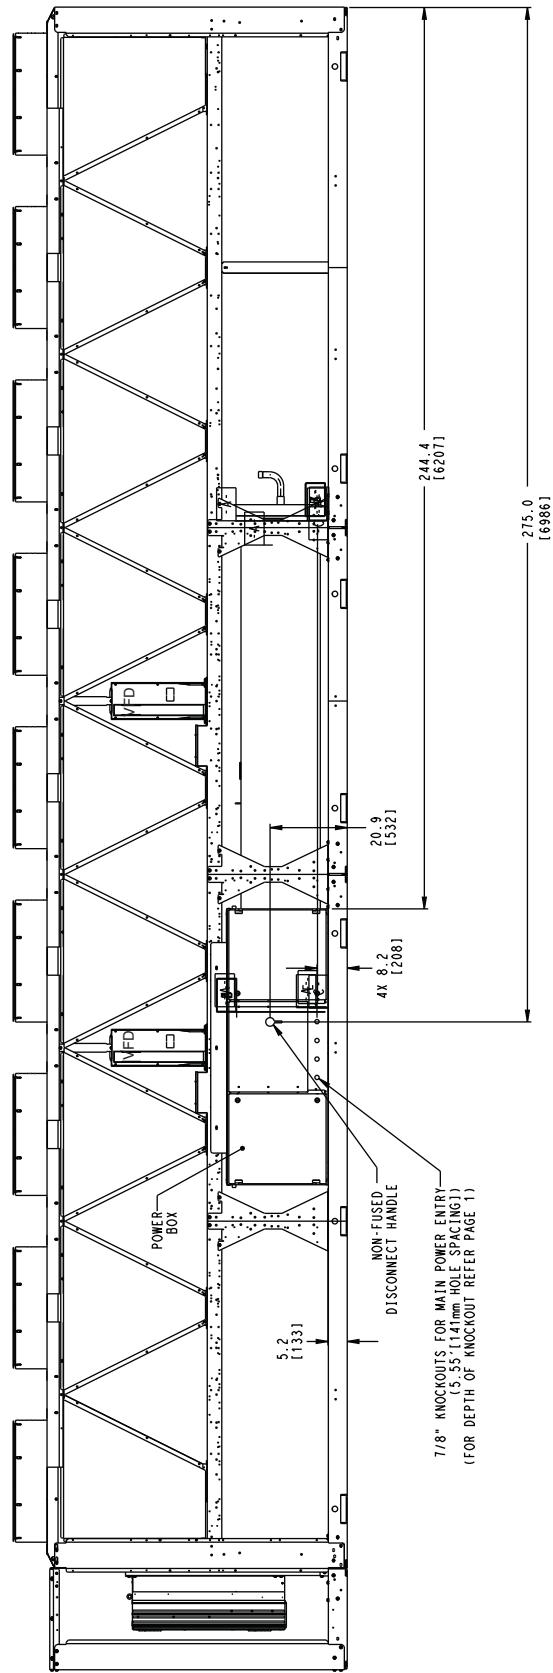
30XA327,352 Air-Cooled Liquid Chiller Dimensions (DX Cooler) (cont)
